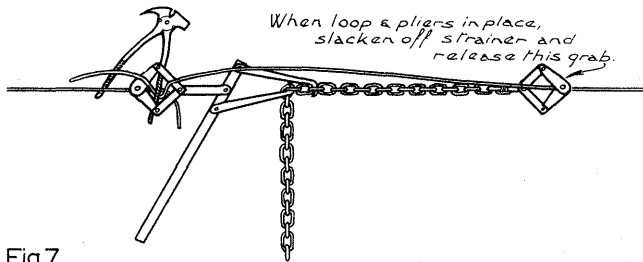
METHOD OF LOCKING WIRE TO RELEASE CHAIN GRAB FOR FRESH GRIP
